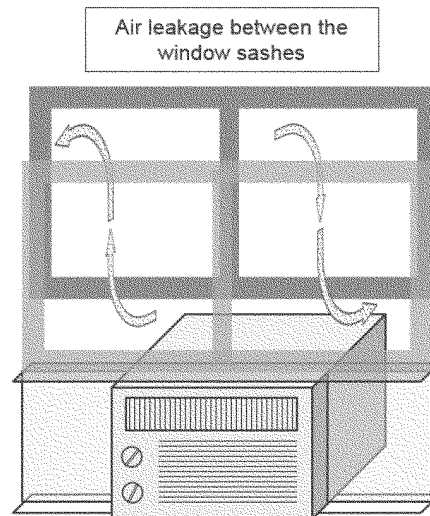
Air Leakage Between Sashes, Louvered Room Air Conditioners in a Hung-Sash Window Installation
